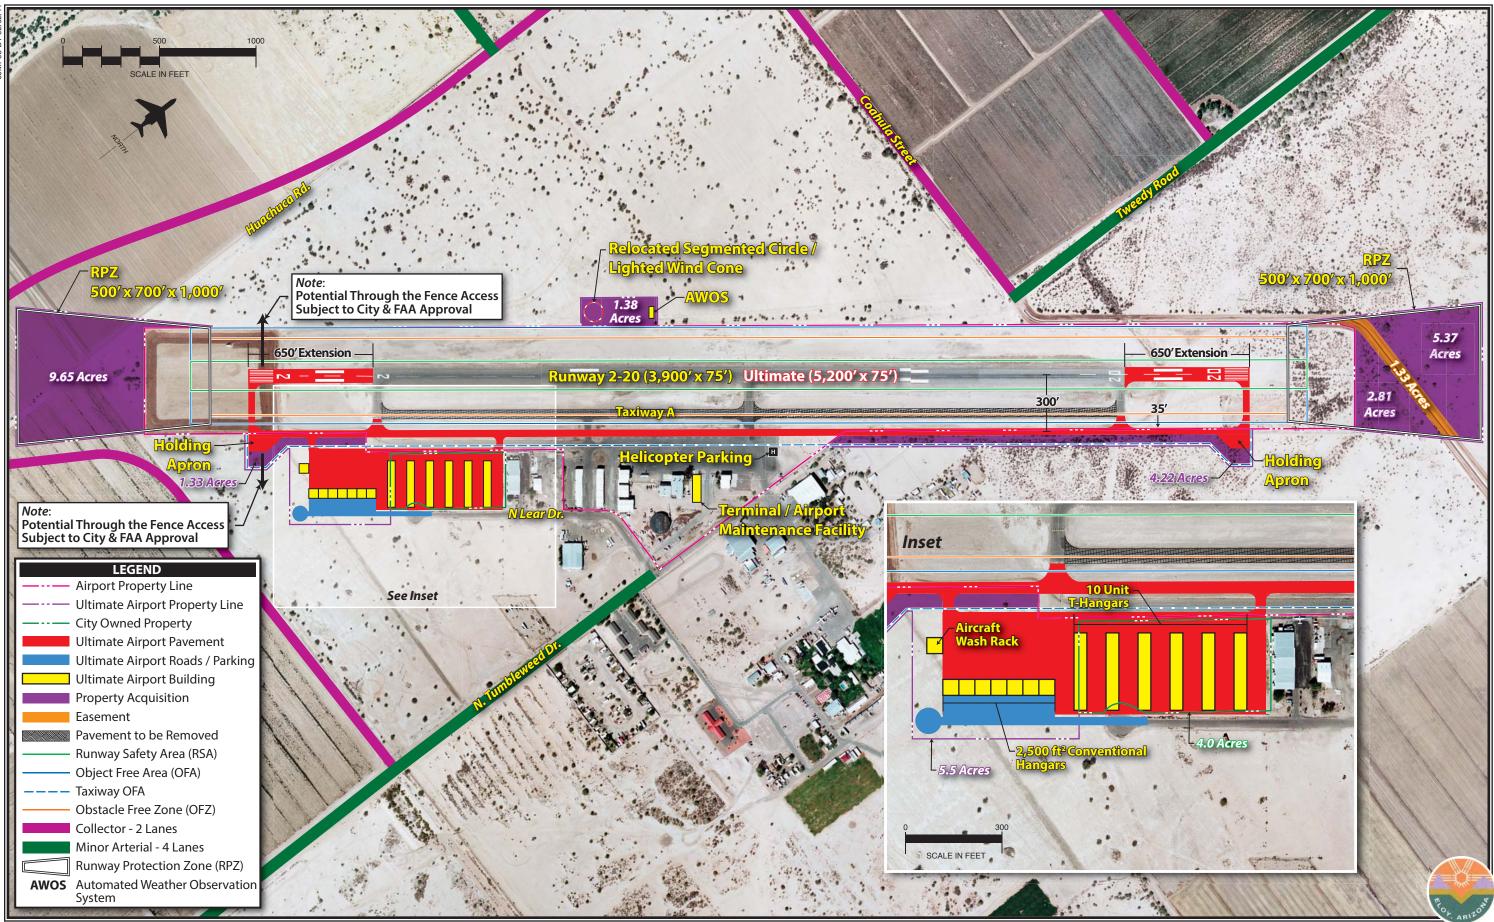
Exhibit IB RECOMMENDED MASTER PLAN CONCEPT
